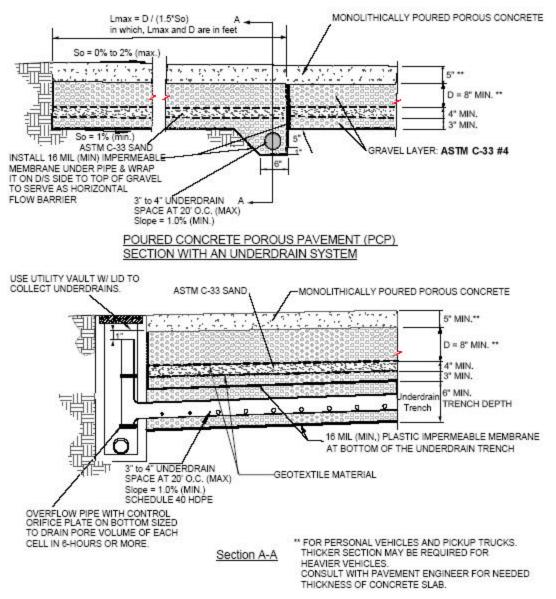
Schematic of Permeable Concrete Installation (after UCFCD, 2004)
